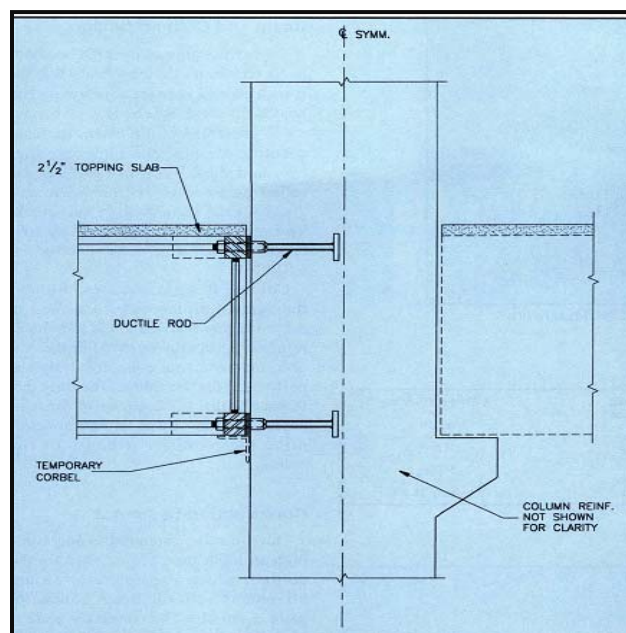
a: Frame beam to column connection detail elevation [25].
